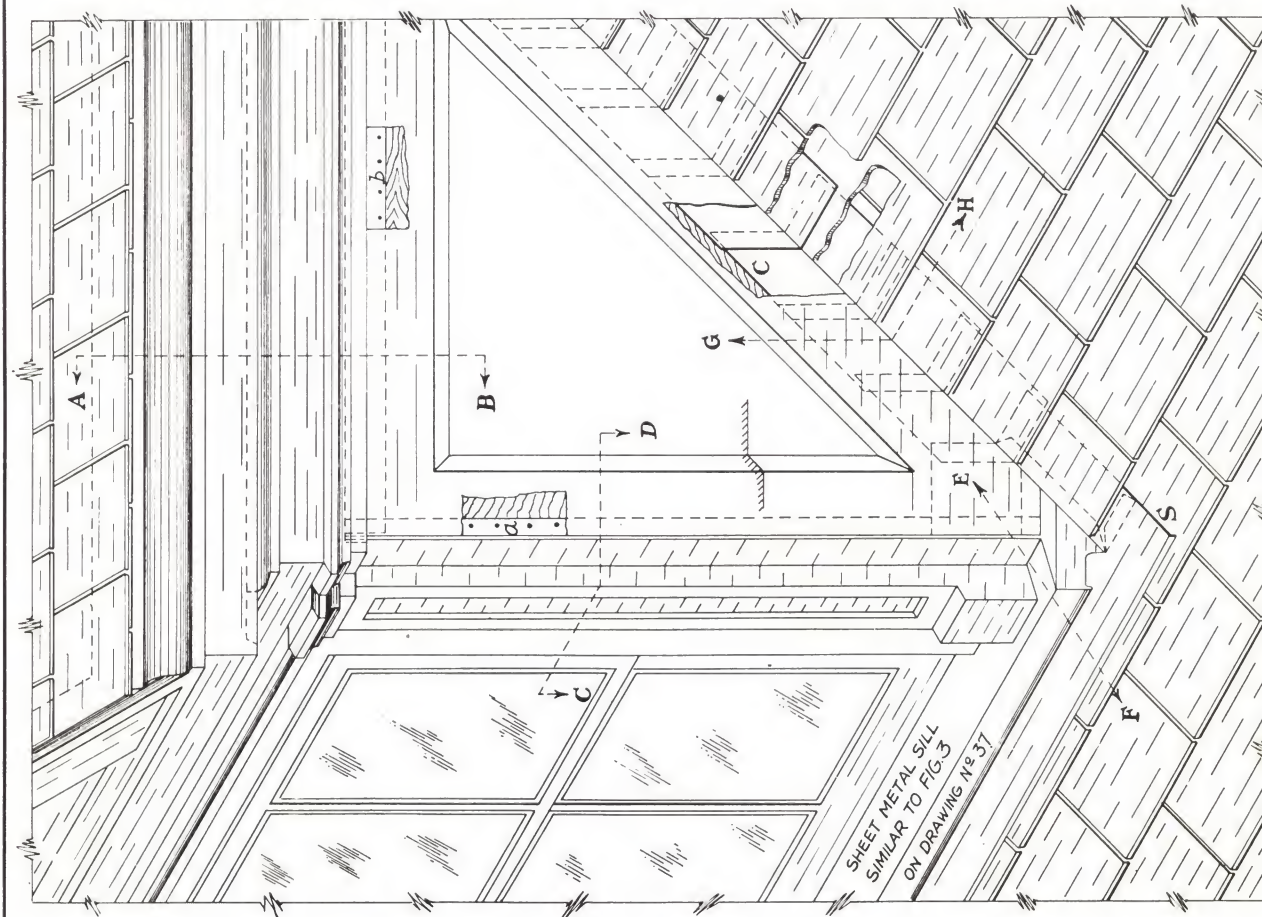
FLASHING DORMER WINDOW WHEN ENTIRE DORMER IS OF SHEET METAL
